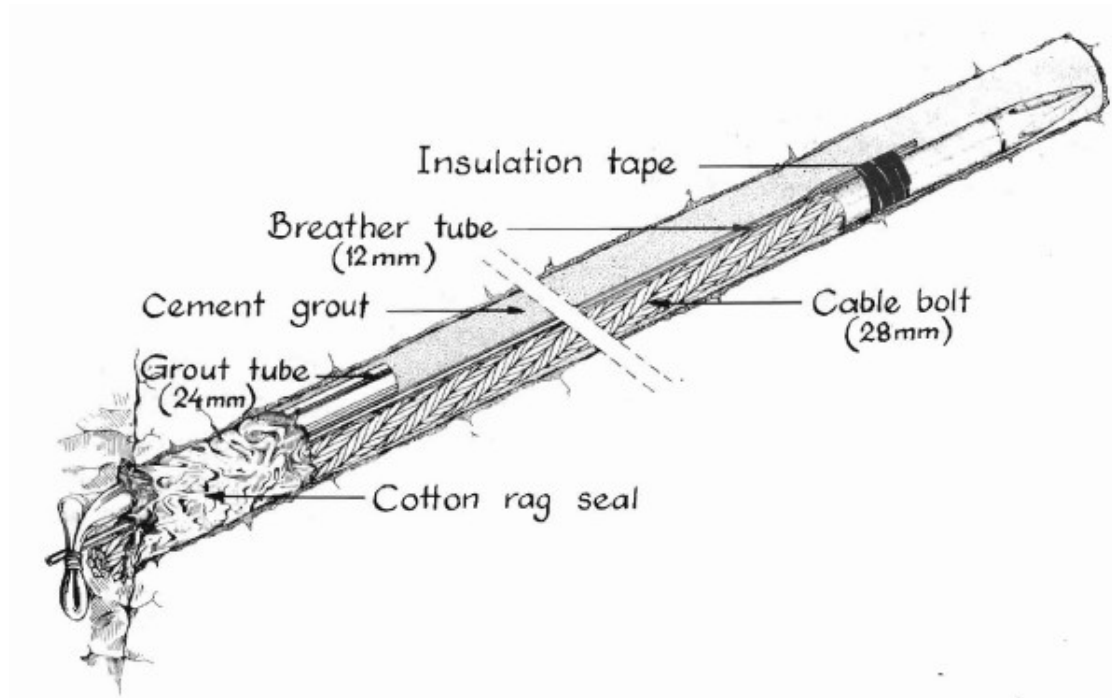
Principle of installation of a long fully grouted cable bolt
